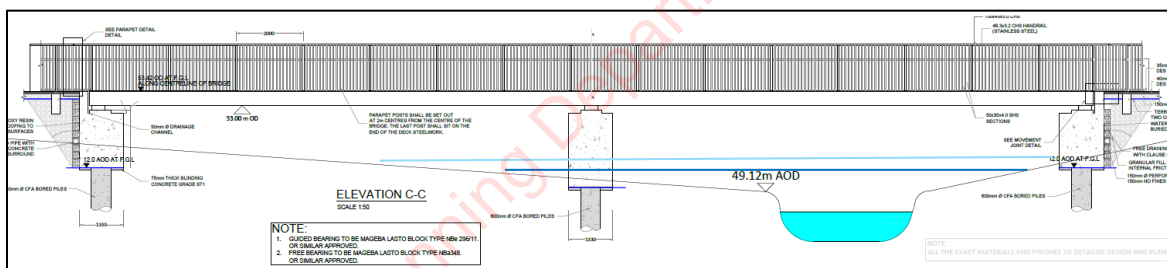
Pedestrian and cycle Bridge 3 Location
